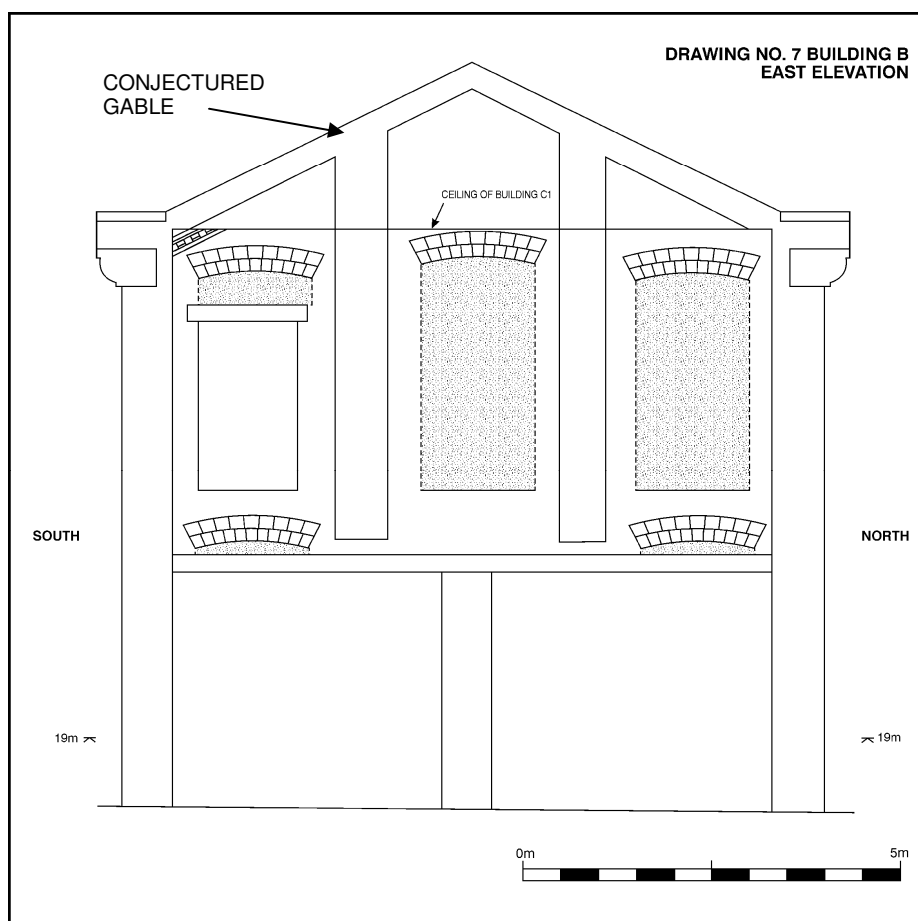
Survey drawing of the east elevation of Building B (scale 1:100)
